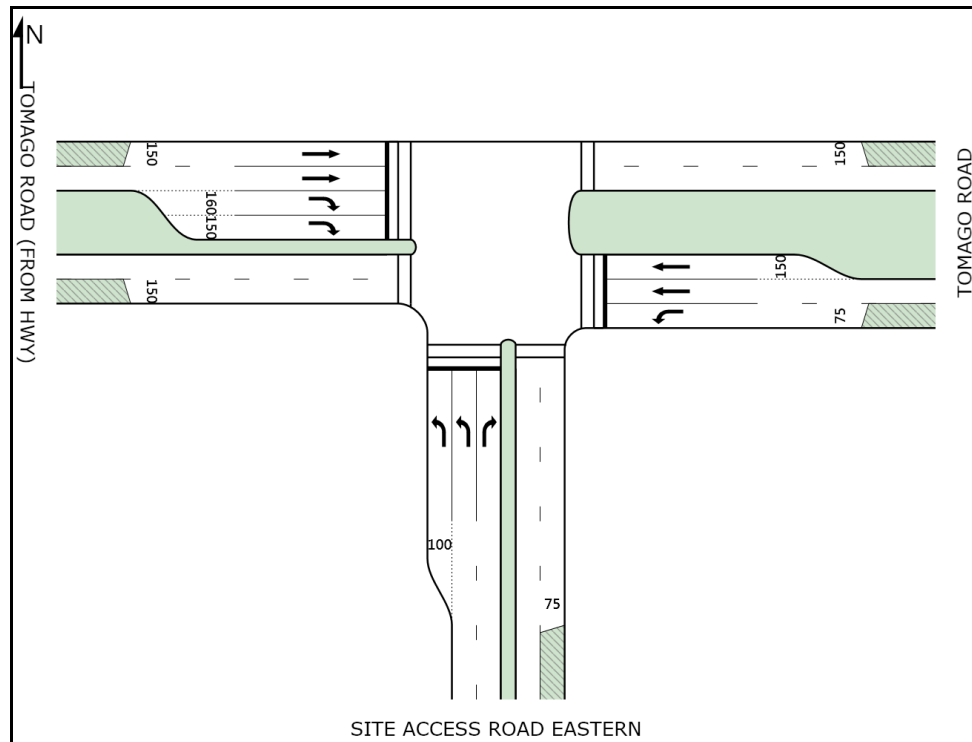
SIDRA GEOMETRIC LAYOUT, EASTERN INTERSECTION
